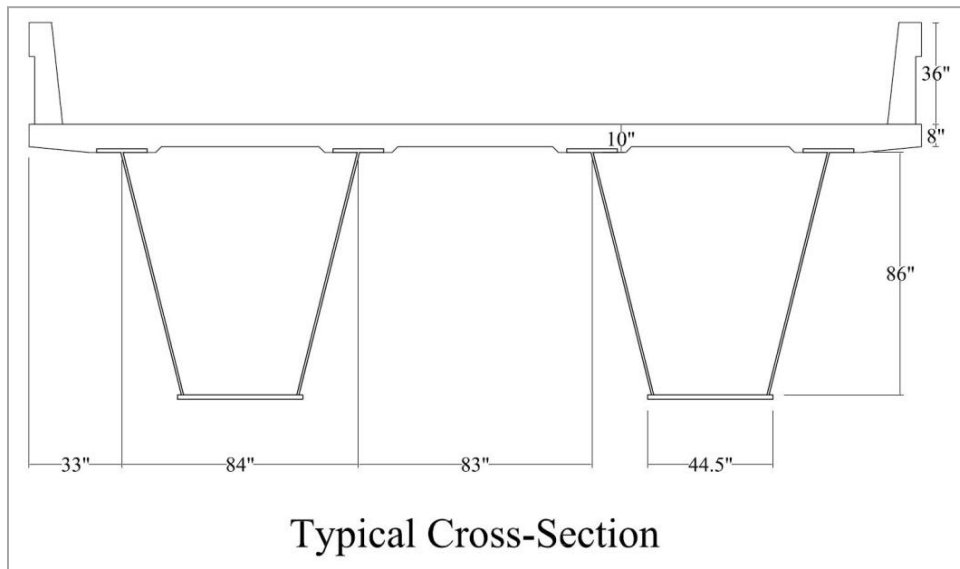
Typical cross-section of the Woodway Bridge Span 11
